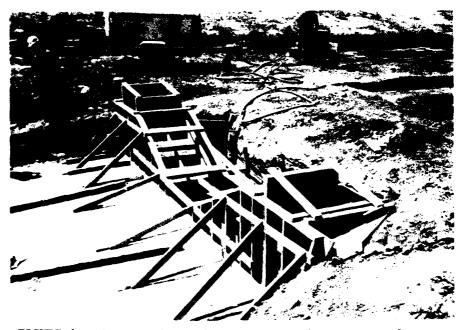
Forming for collar structural concrete after build up of backfill concrete beneath collar forming. Downstream is to right.
